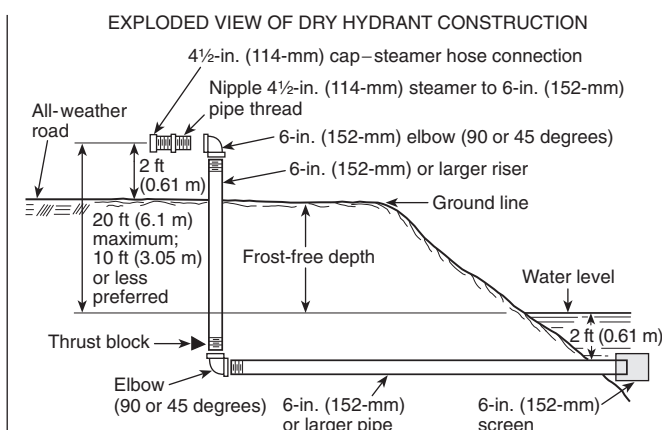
(a) Dry hydrant construction using iron, steel, or PVC pipe.
